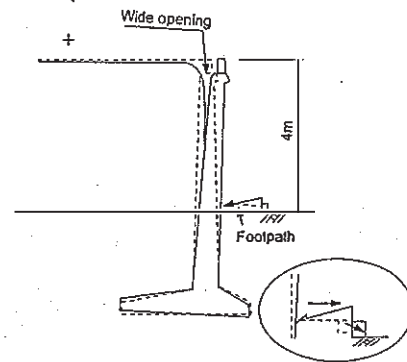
Typical damage to cantilever RC RWs for embankment of JR Sanyo Line between Hyogo and Shin-Nagata Stations
